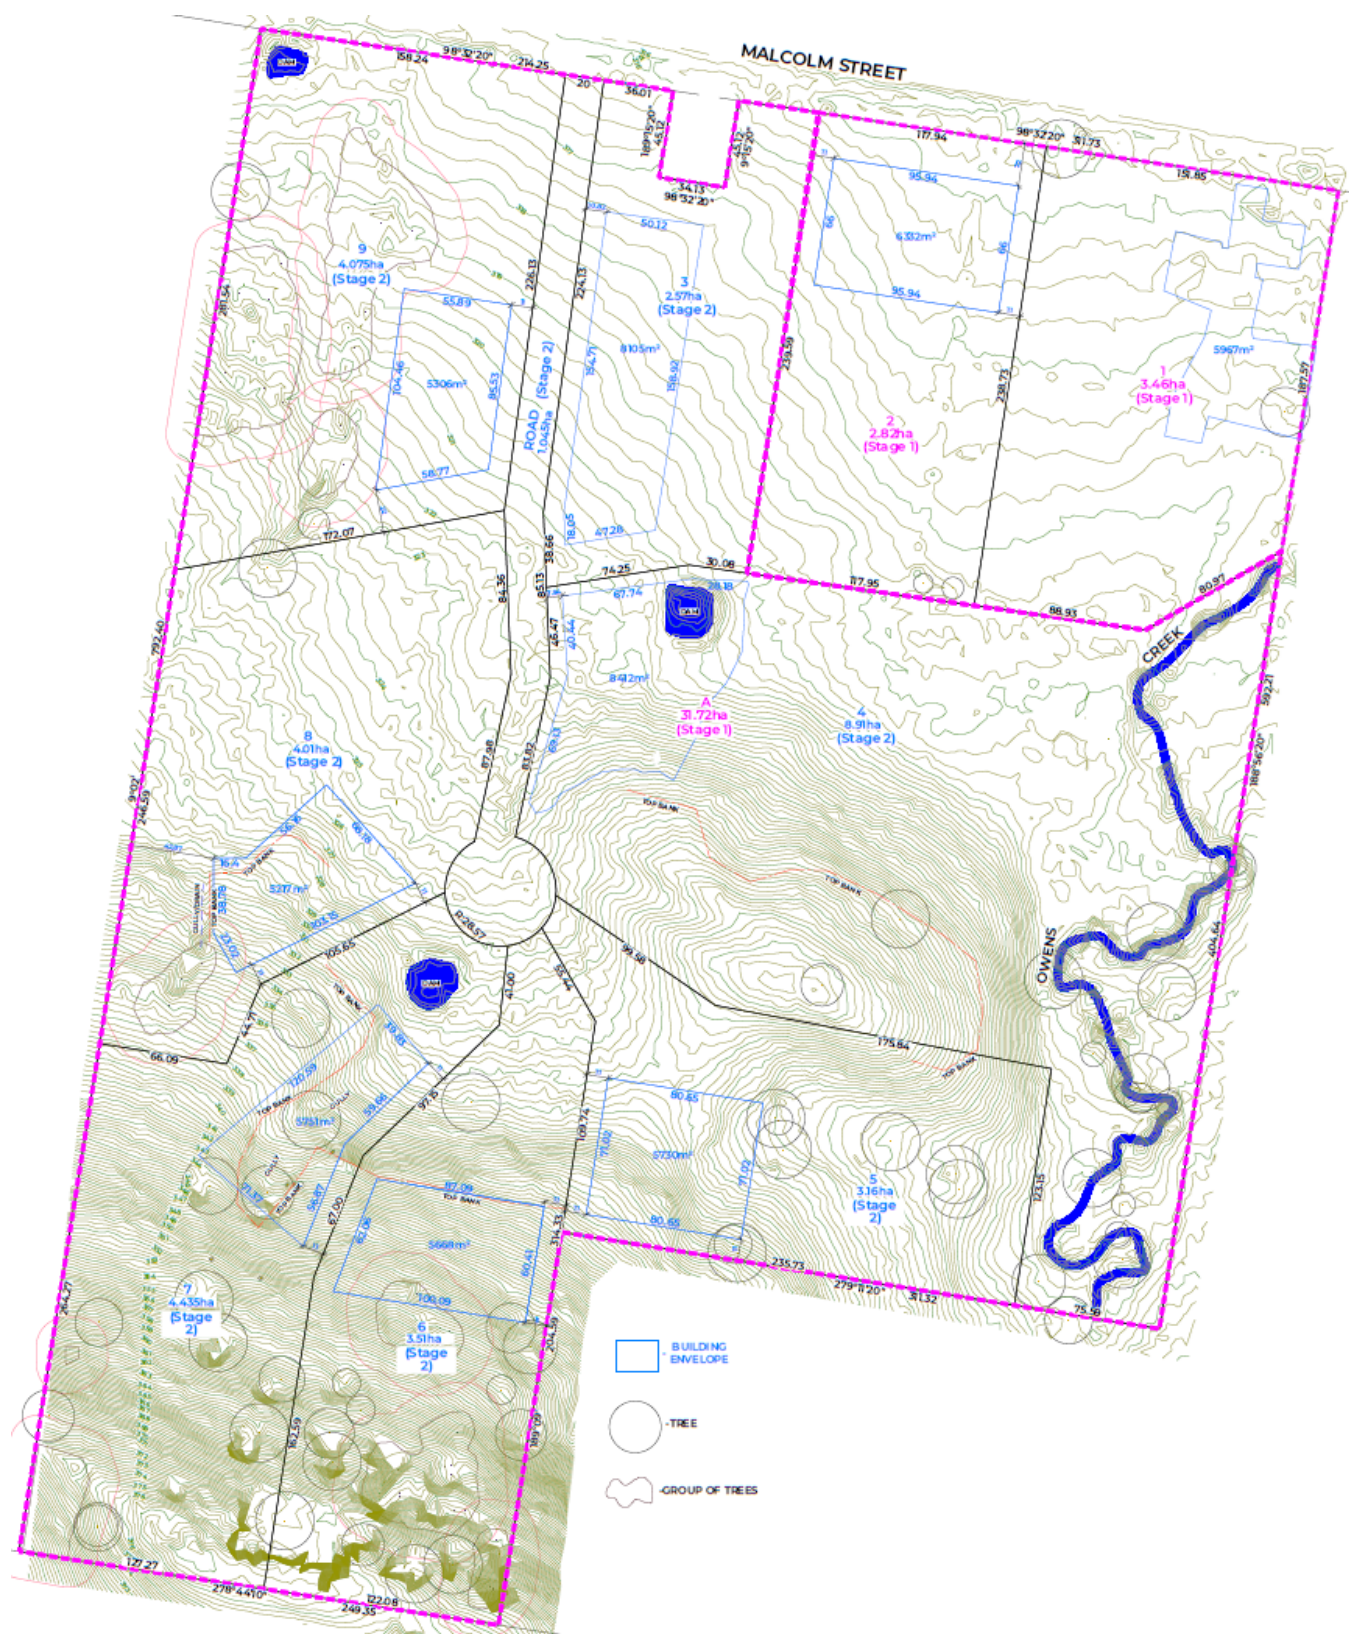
Proposed plan of subdivision, showing Building Envelopes and Tree Protection Zones
